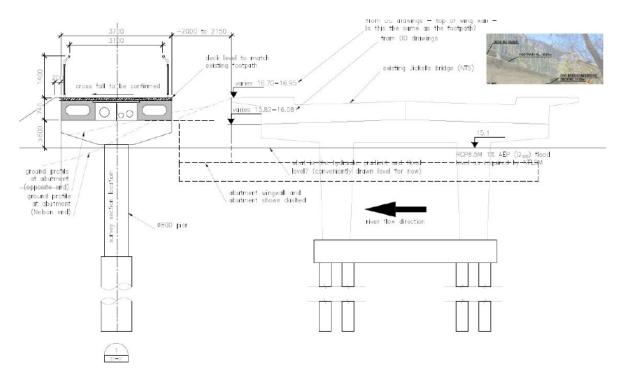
Typical Bridge Cross Sections. (Source: Davis CDT Consultants)
